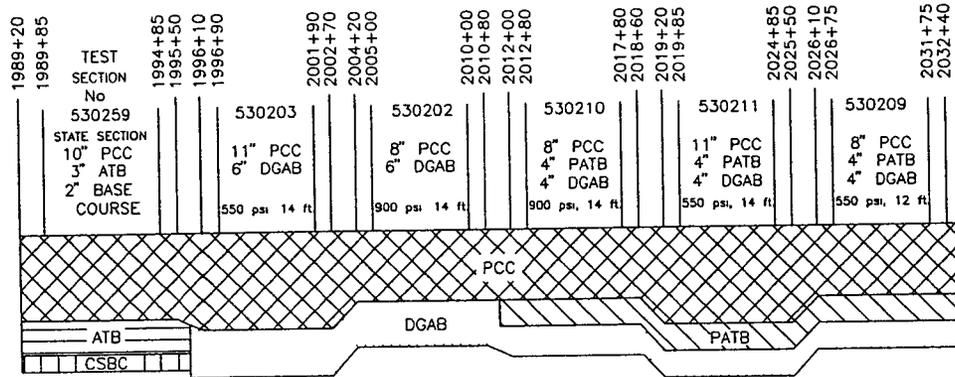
illustrates the ordering and combination of the experimental SPS-2 test section pavement structures to be constructed. Construction stations are shown in this figure. Stylized transitions in the pavement structure are shown between the test sections.
